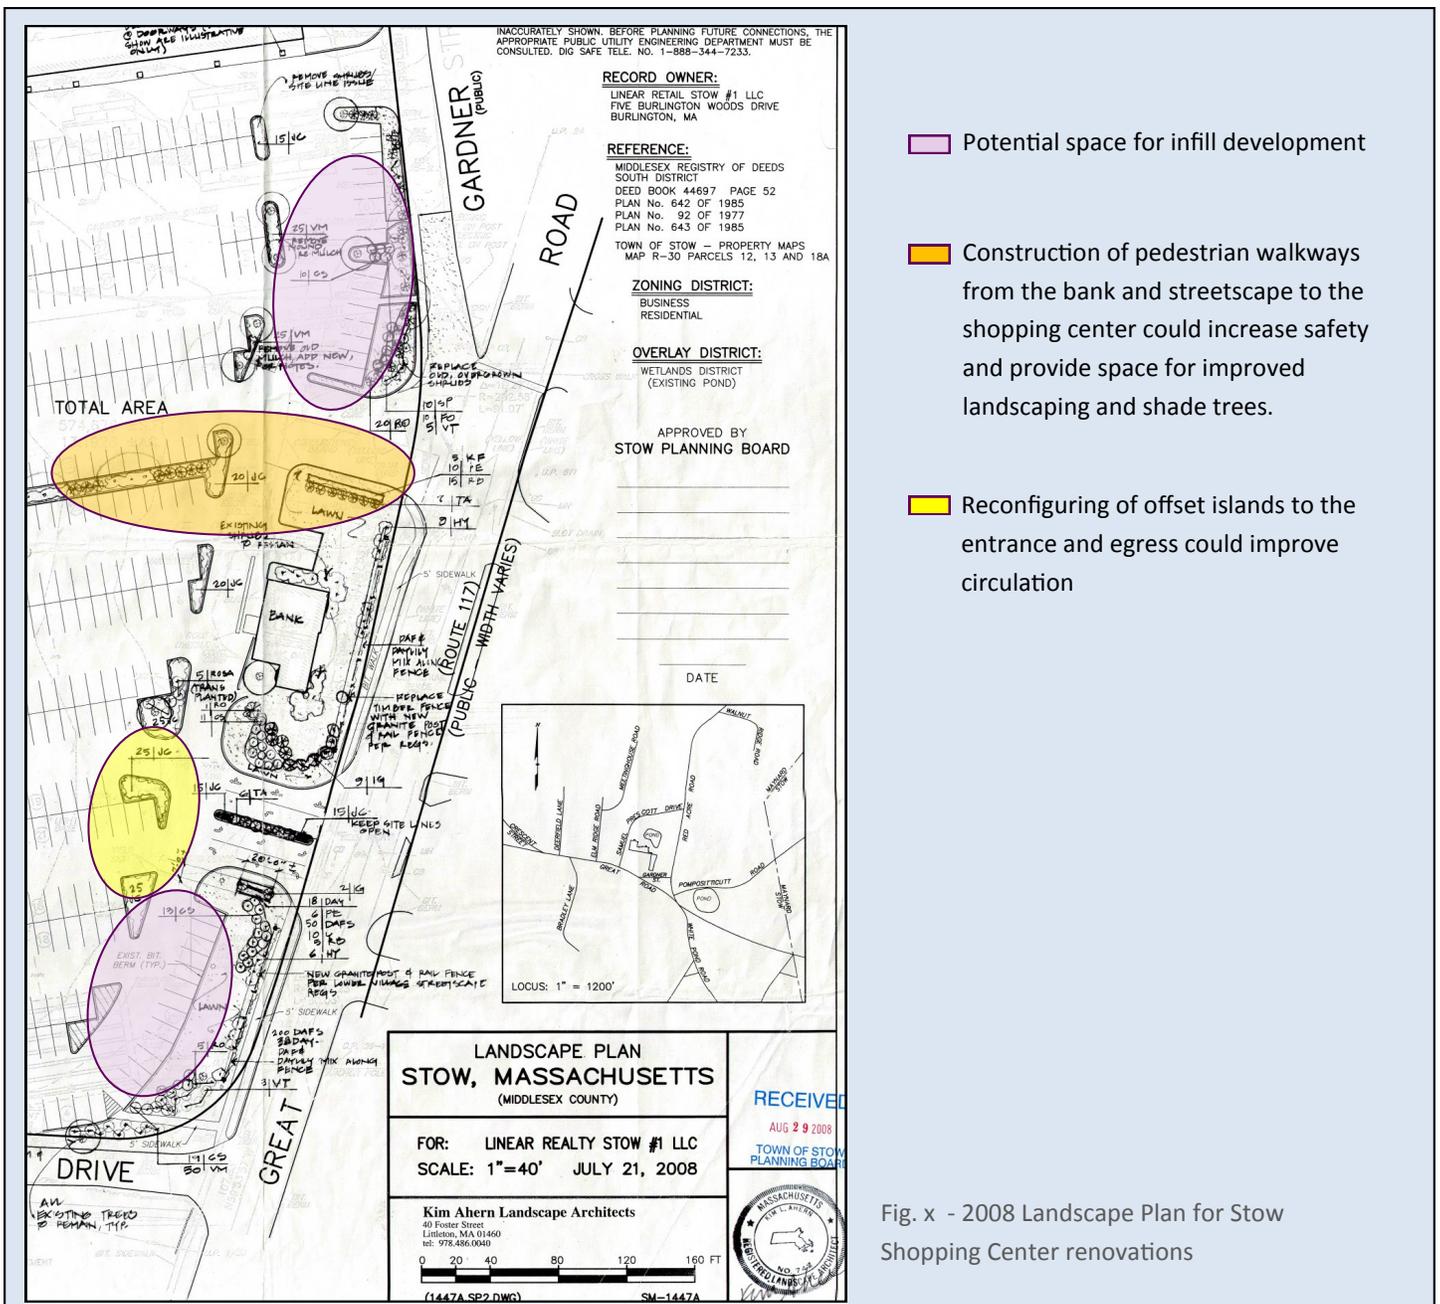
Landscape Plan for Stow Shopping Center renovations
